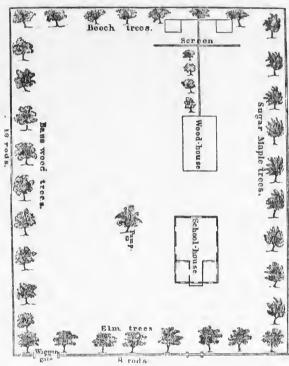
,-Block Plan of School Grounds, etc.-No. 1.
